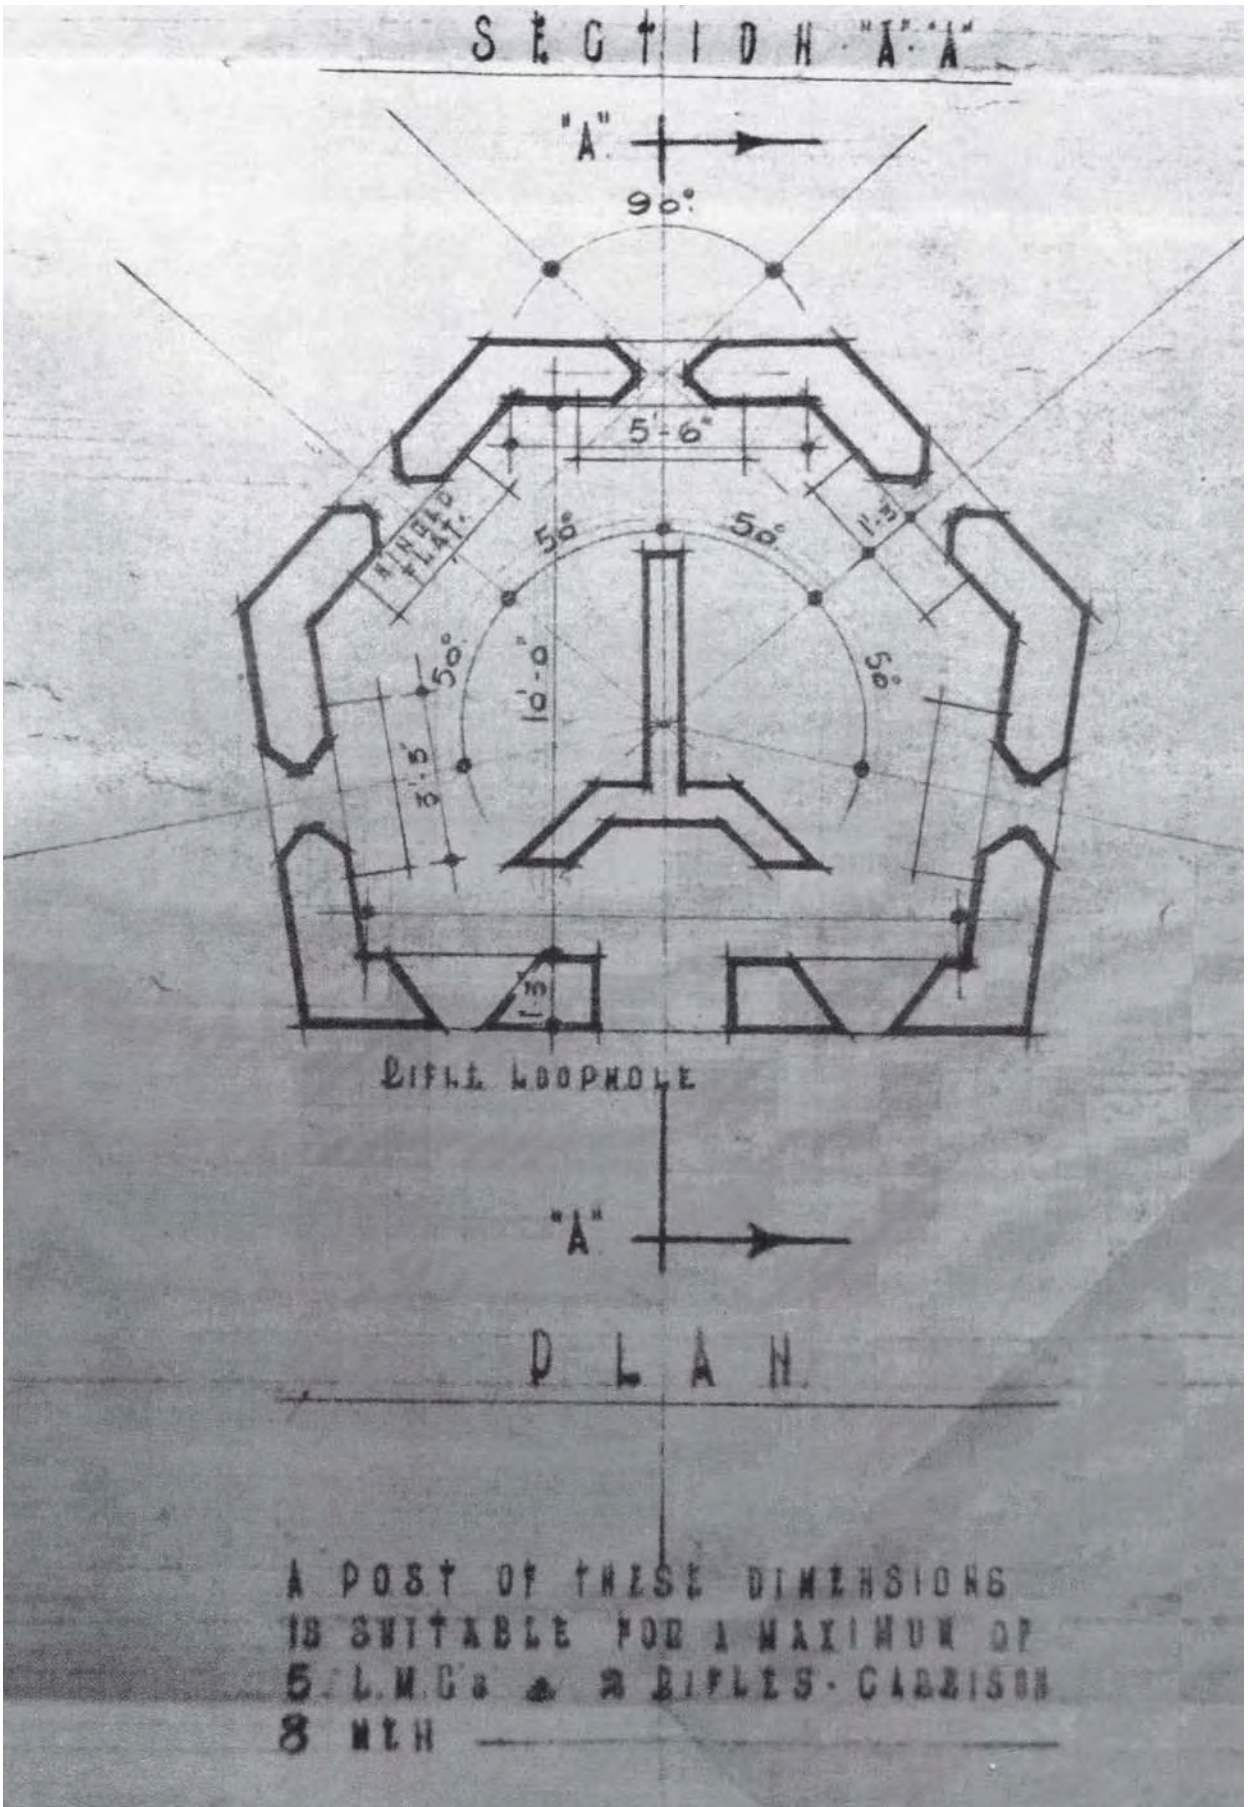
Directorate of Fortifications and Works plan of Type 24 pill box
